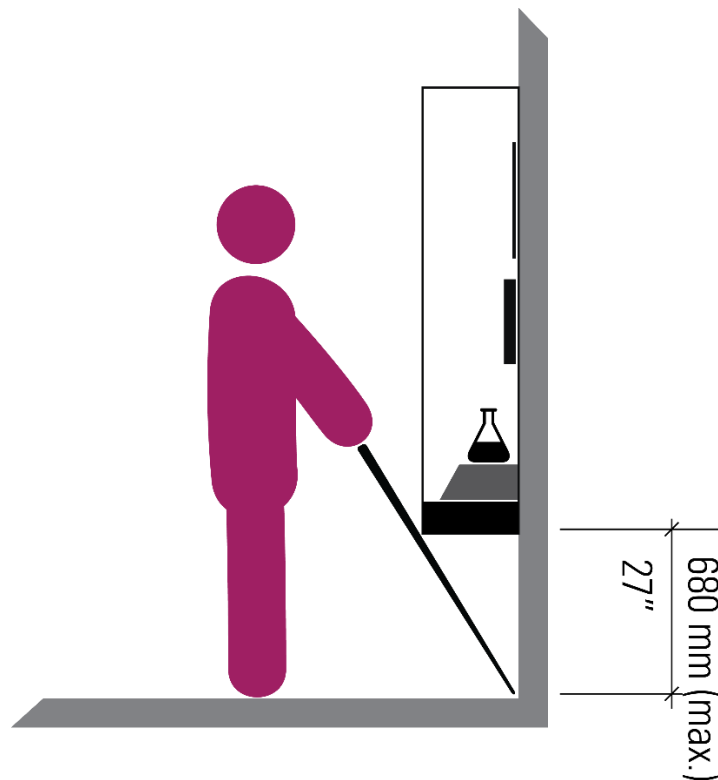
Adult using a cane to detect a wall mounted obstruction
